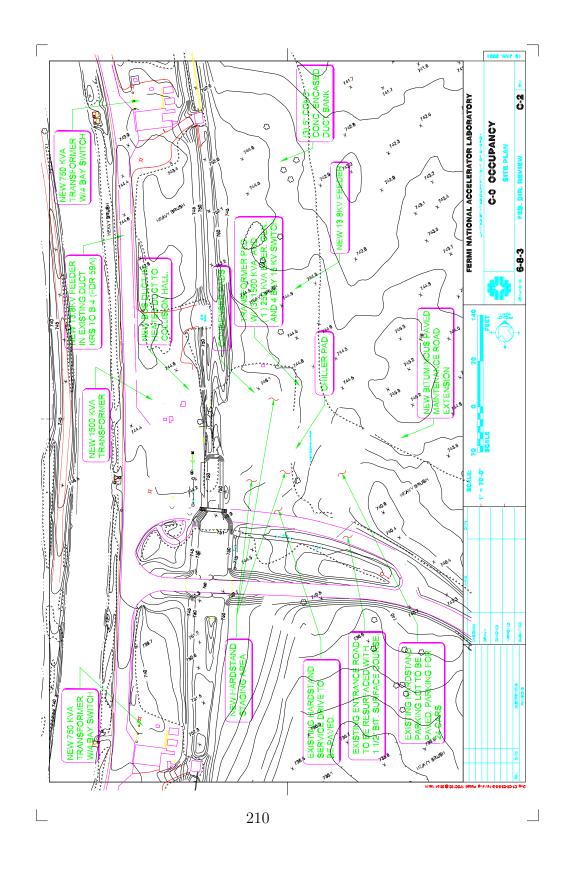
Layout of different buildings and components associated with the C-0 site.
